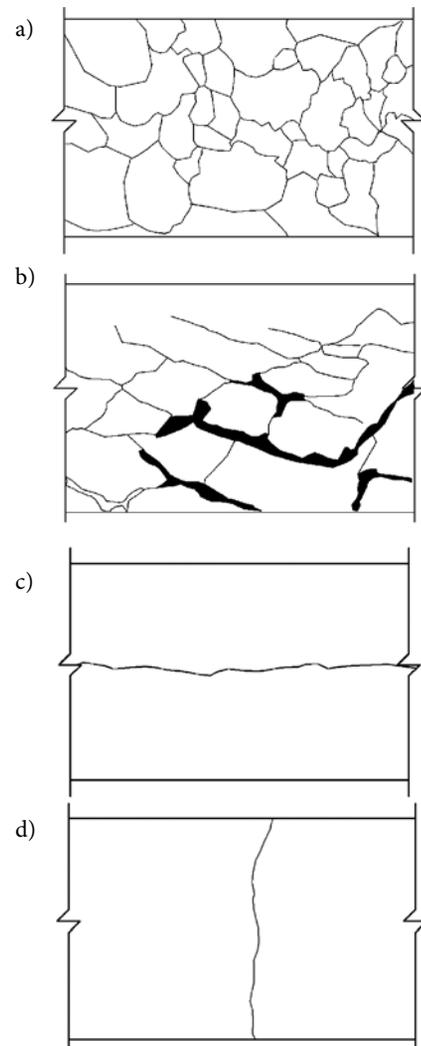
Pavement cracks: a) – fatigue or alligator cracks; b) – block cracks; c) – longitudinal cracks; d) – transverse cracks
